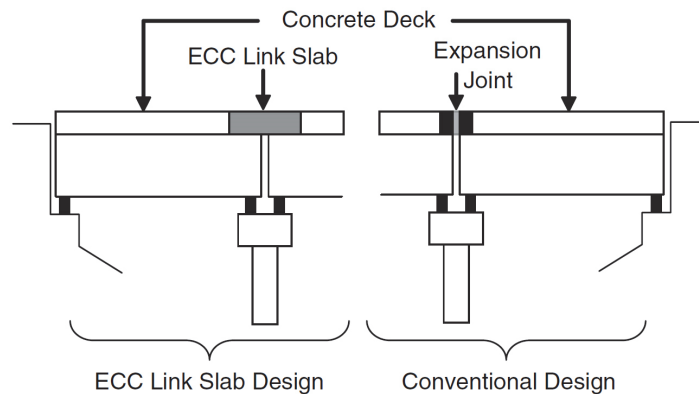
Bridge deck system definition (after Kendall<sup>38</sup>)
